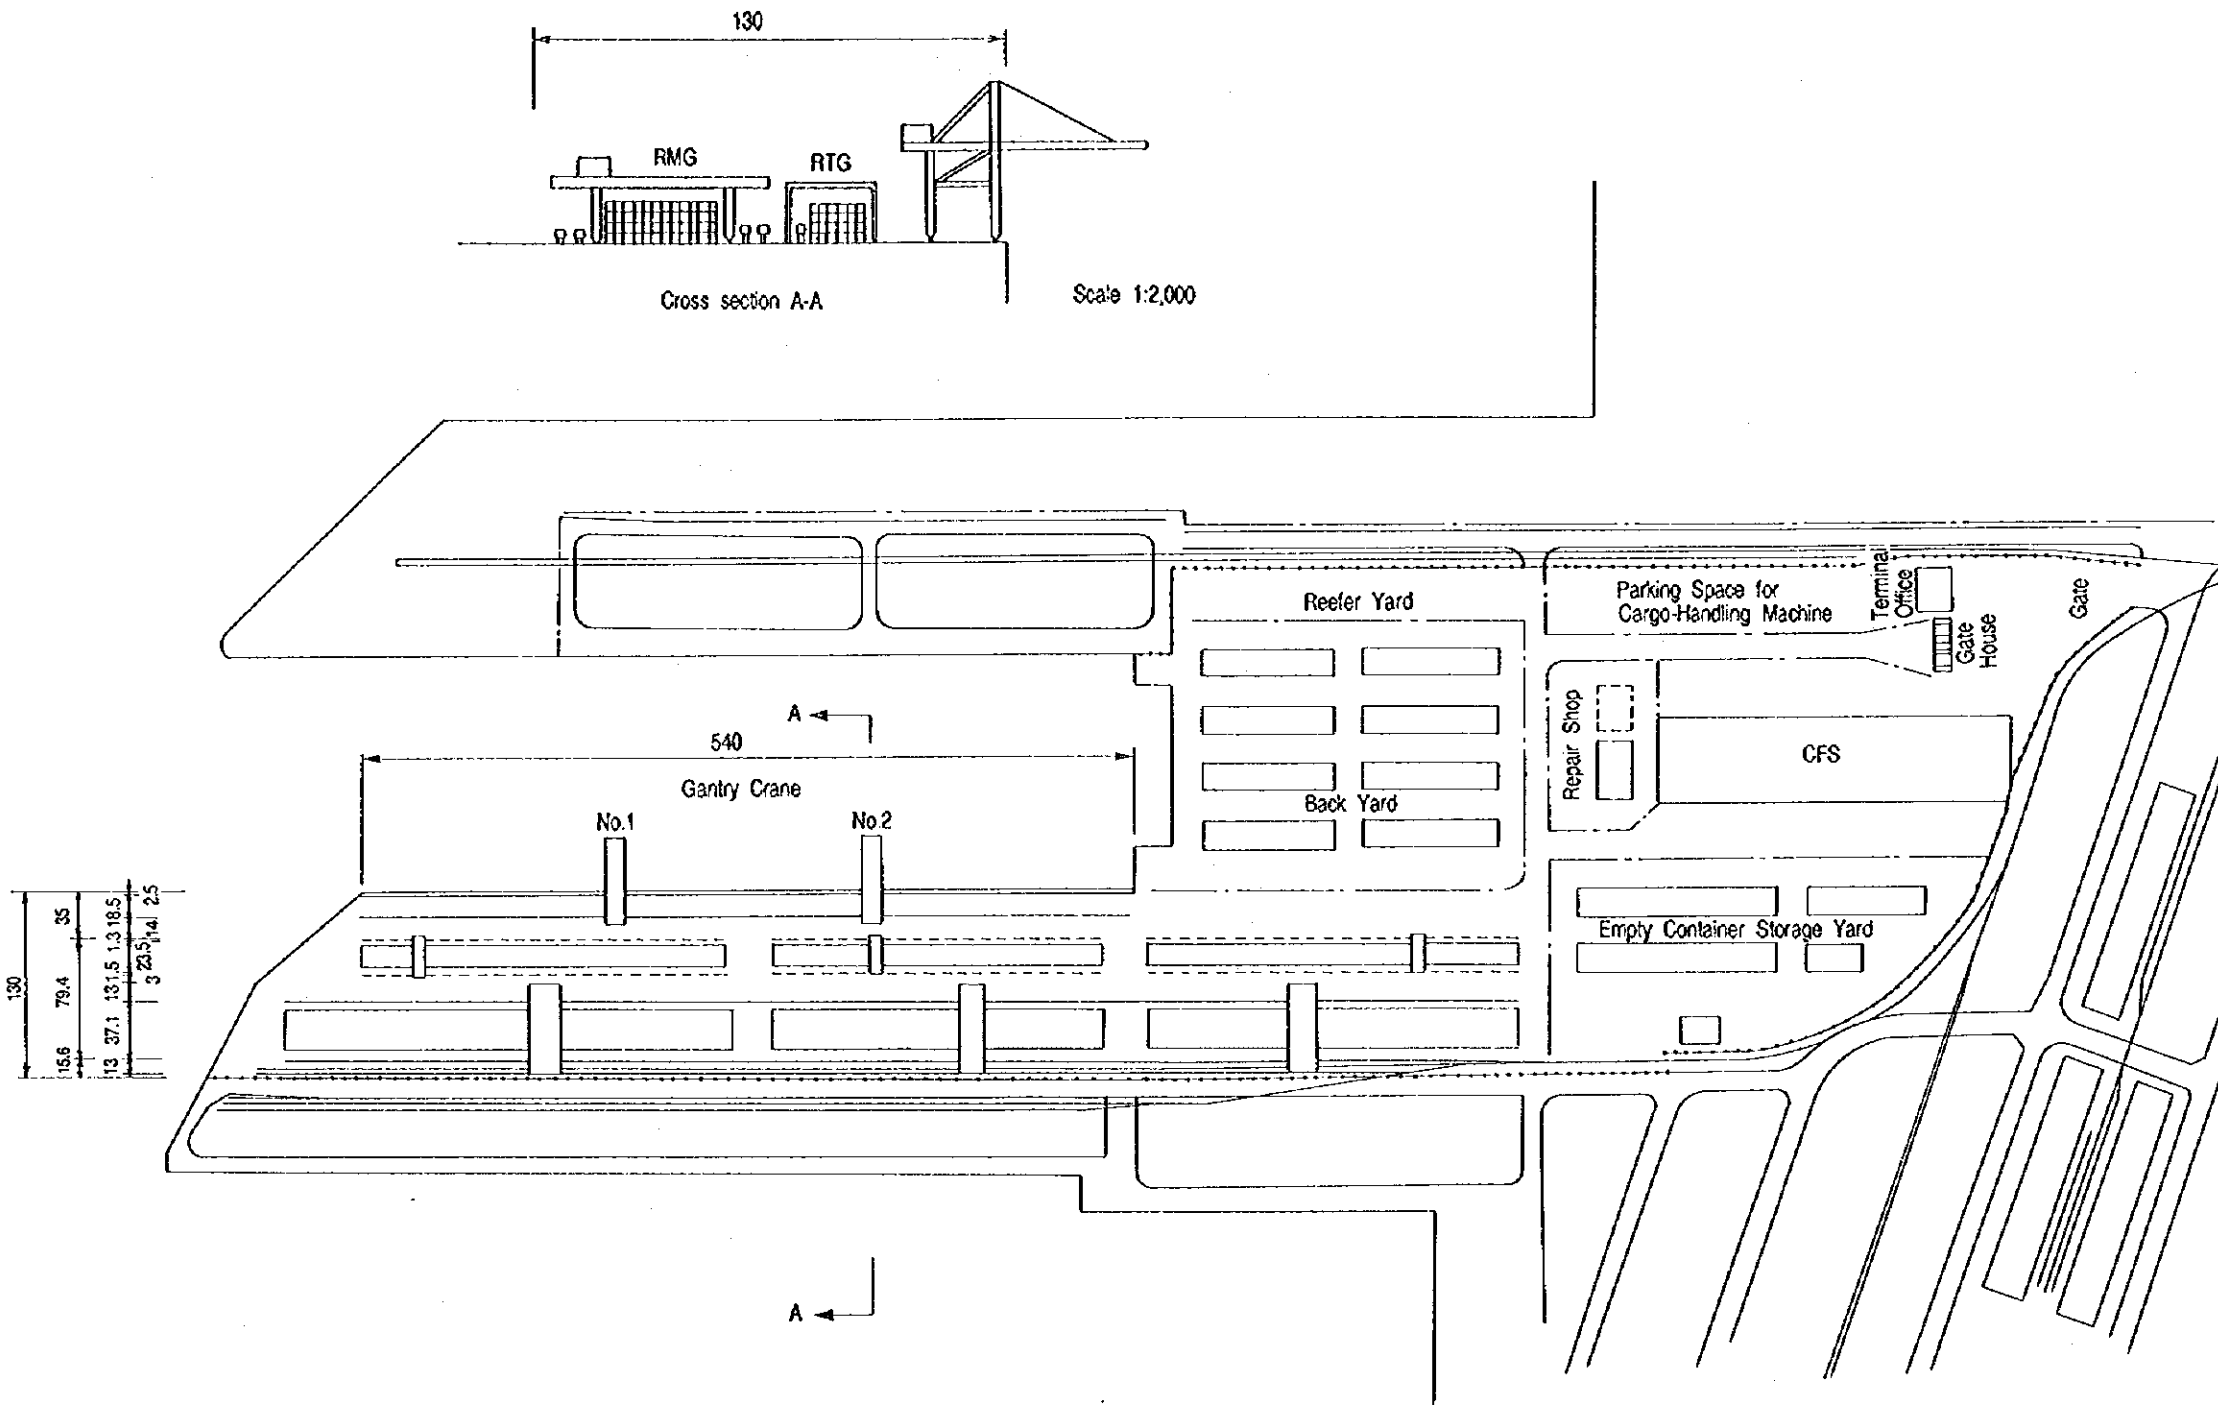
Layout Plan of the Main Facilities (Transfer Crane System)
